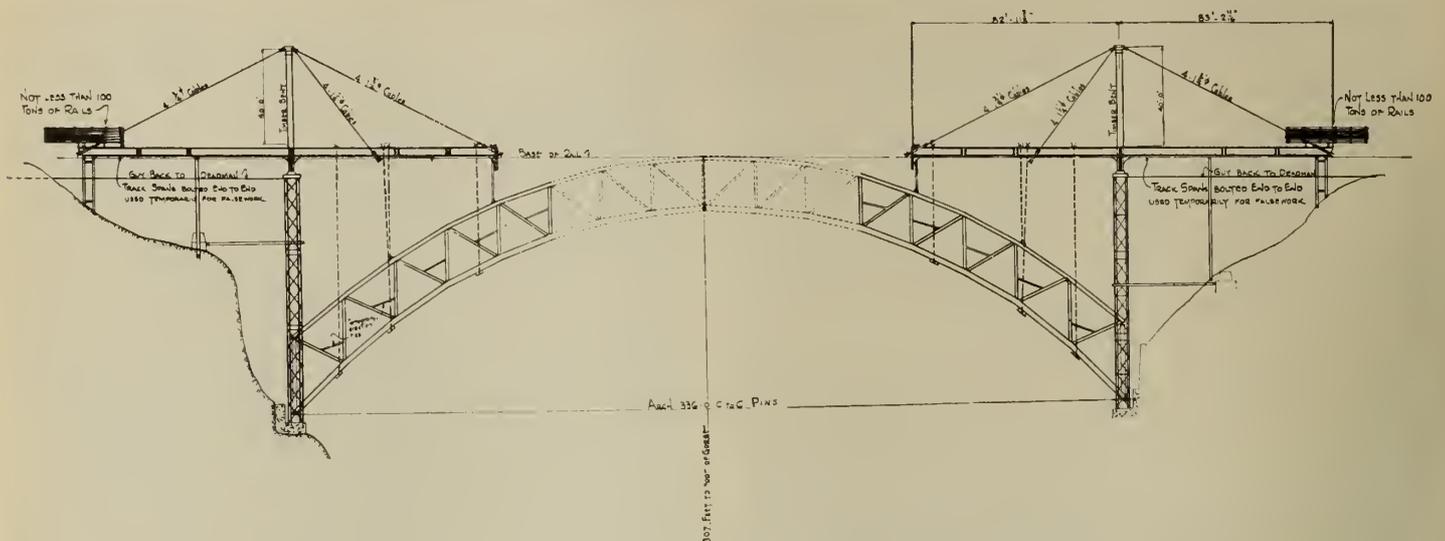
Scheme for Erecting New Arch Ribs by Cantilever Trusses without Loading Old Bridge.
